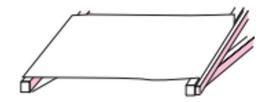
Sketch showing slopped roof with tight plastic sheets ²⁷⁶
